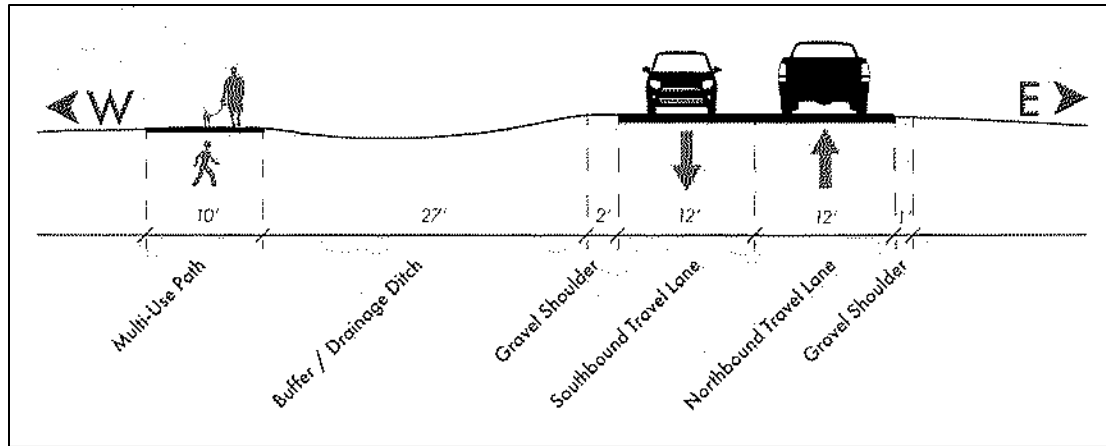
TYPICAL SECTION, SOUTH PARK LOOP ROAD (NORTH-SOUTH ORIENTATION)
